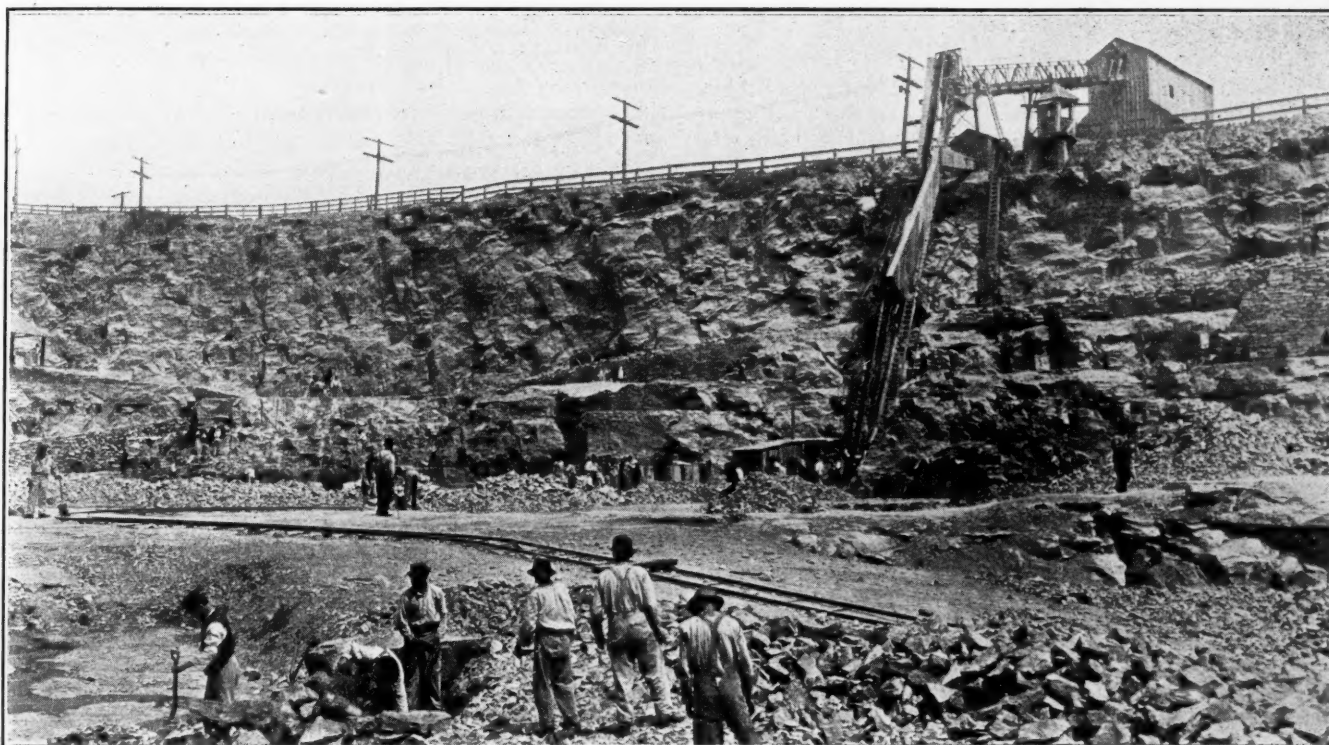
STONE MOVED BY HAND CARS AND ELEVATED TO CRUSHER BY BUCKET CONVEYOR.
